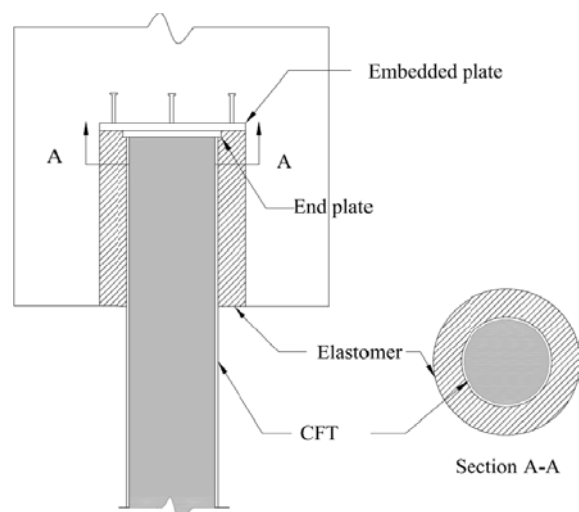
Proposed detail of flexible pile cap connection. CFT = concrete-filled tube.
